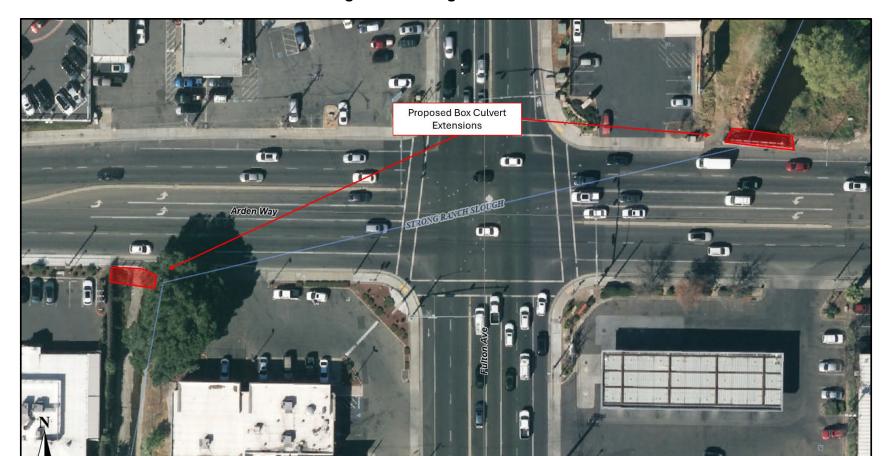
Strong Ranch Slough Box Culvert Extensions
